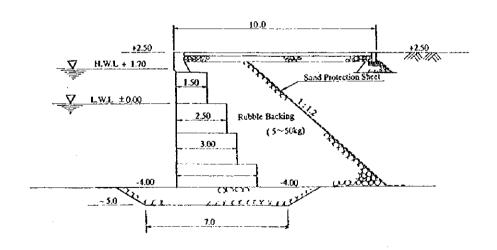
(4) Typical Cross Section of Quaywall (Concrete Block)
